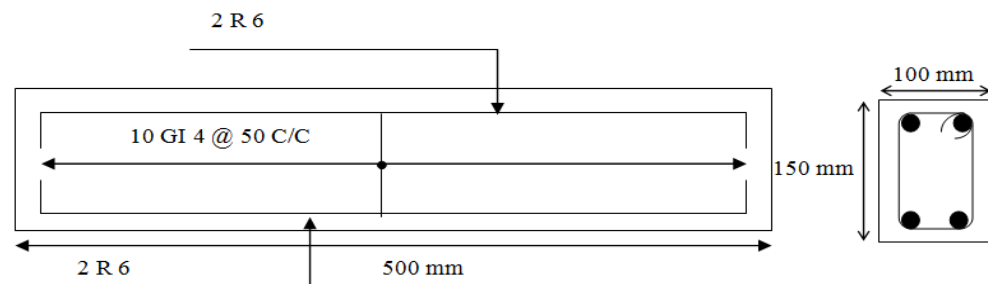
Reinforcement arrangement for flexural strengthened beams
